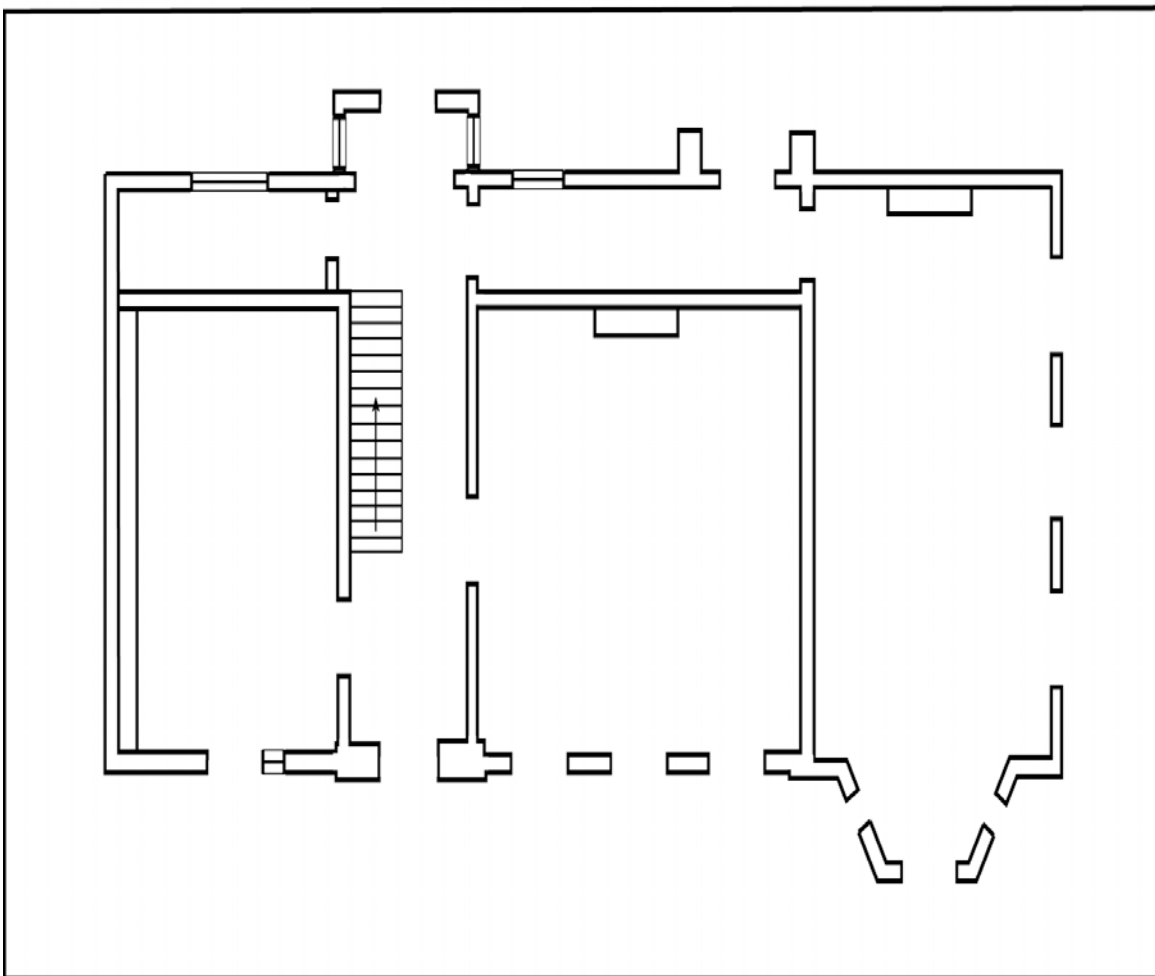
Ground floor plan of Bishop Hale's House (F. Bush)
